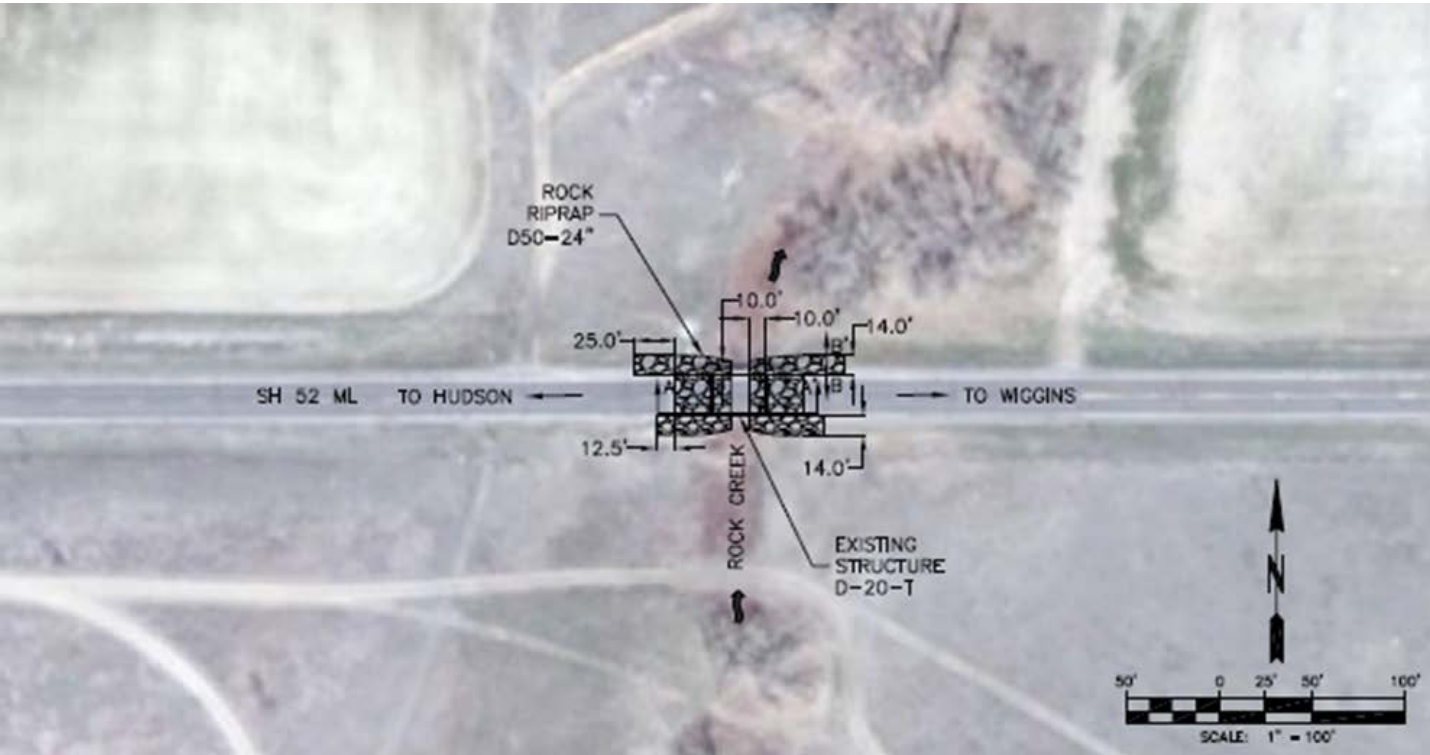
Plan view of Bridge D-20-T with recommended hydraulic scour countermeasure locations
